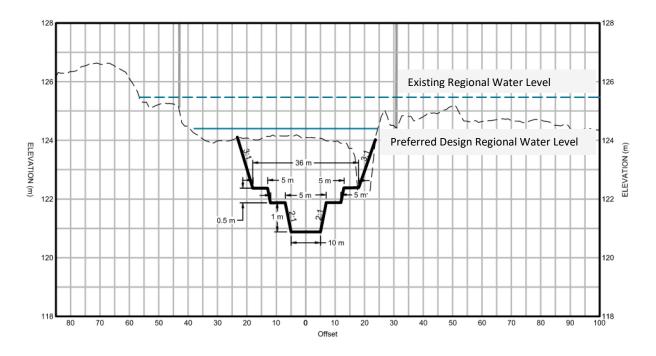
Preferred Design Creek Cross-section: - 200 m upstream of Dixie Road
